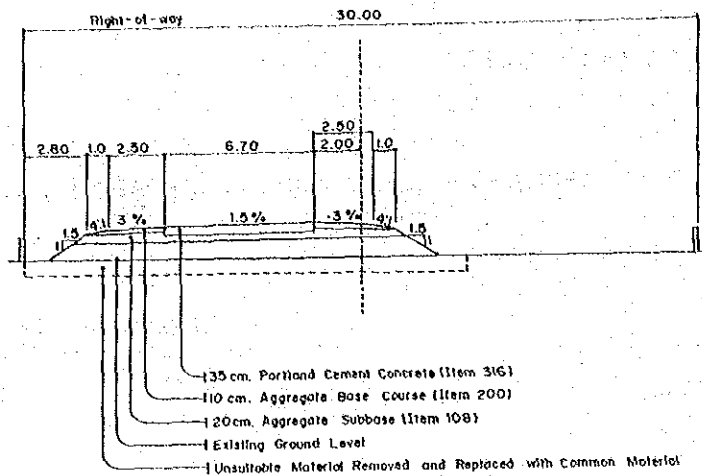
TYPICAL SECTION PLARIDEL BY-PASS/CABANATUAN ALTERNATIVE ROUTE
